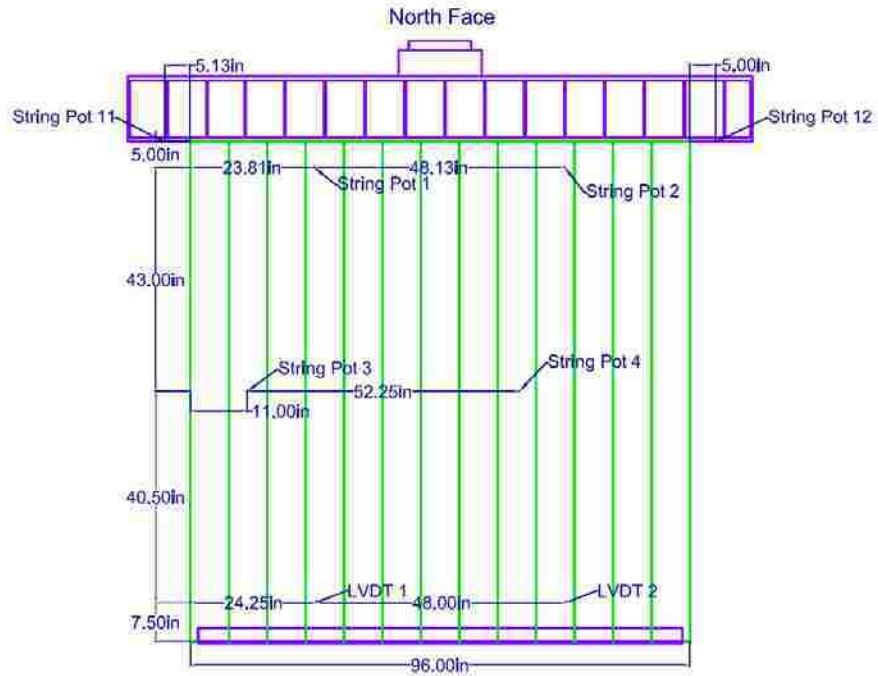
String Pot Locations for the In-Plane Vertical Load Test, North Face
